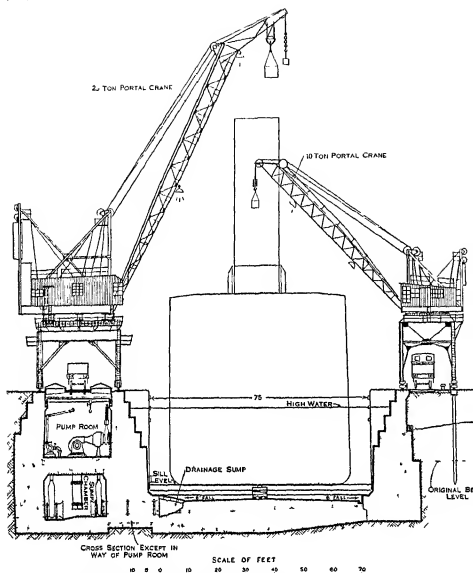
CROSS SECTION THROUGH PUMP ROOM OF DRY DOCK AT THE KING'S DOCK SWANSEA WALES
